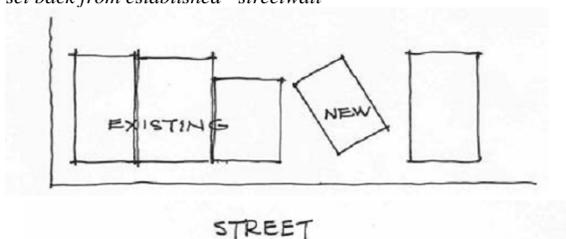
Inappropriate Alignment - skewed orientation of new infill building disrupts established "streetwall"
